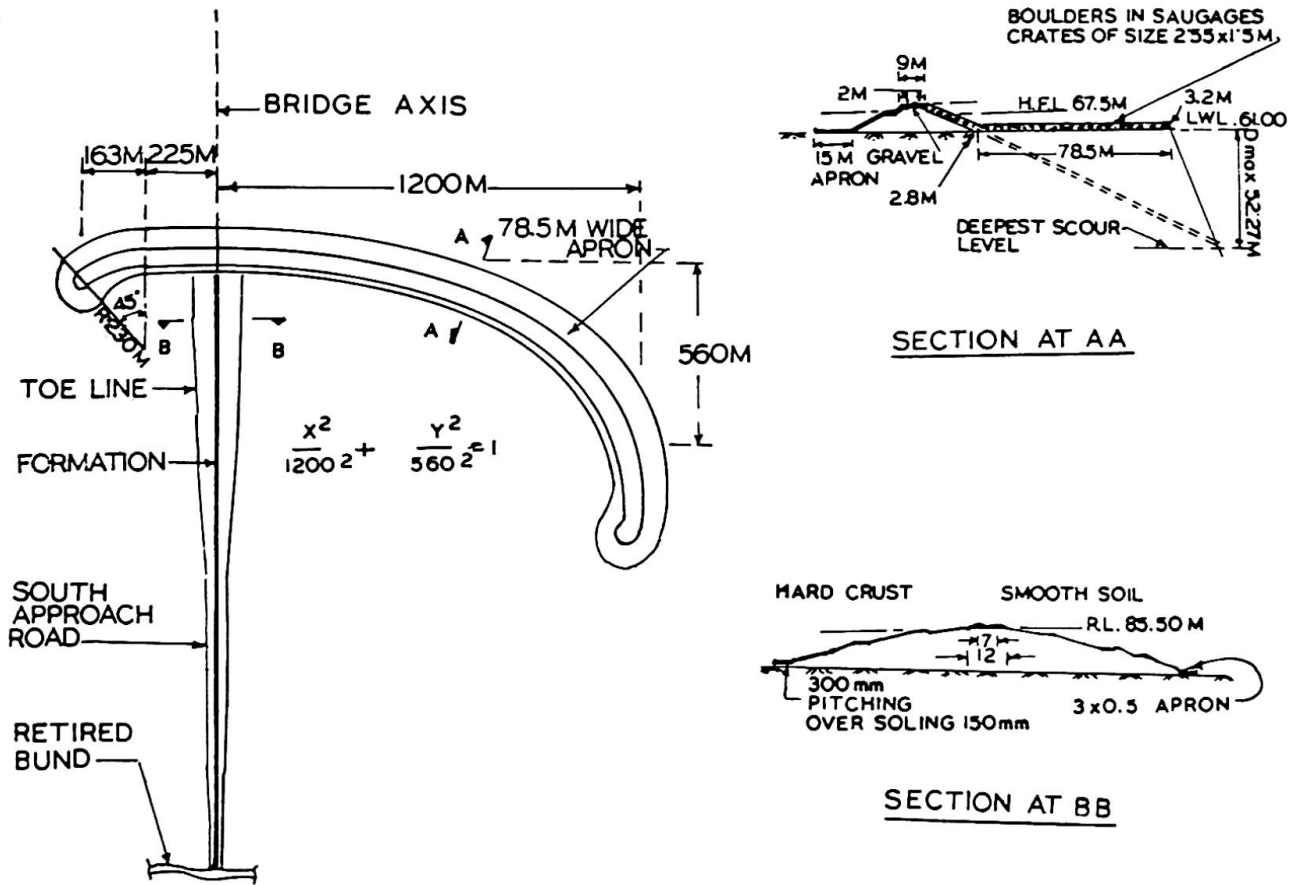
GUIDE BUND DETAILS OF TEZPUR BRIDGE.
